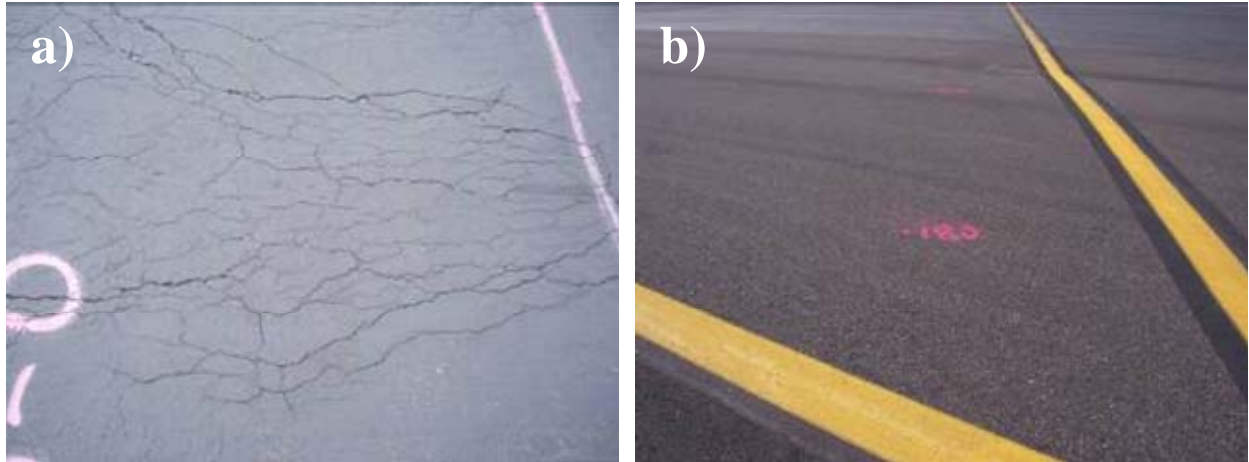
Damaged and Intact Areas on South Ramp Section
